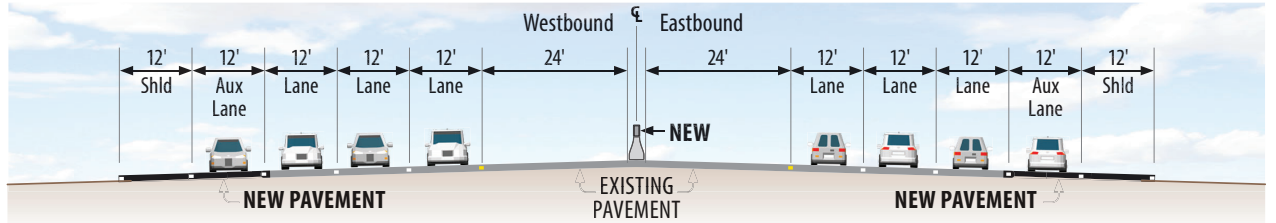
| Typical section B for US60 between Signal Butte and Meridian Roads (inside widening to add GPL and outside to add GPLs)
